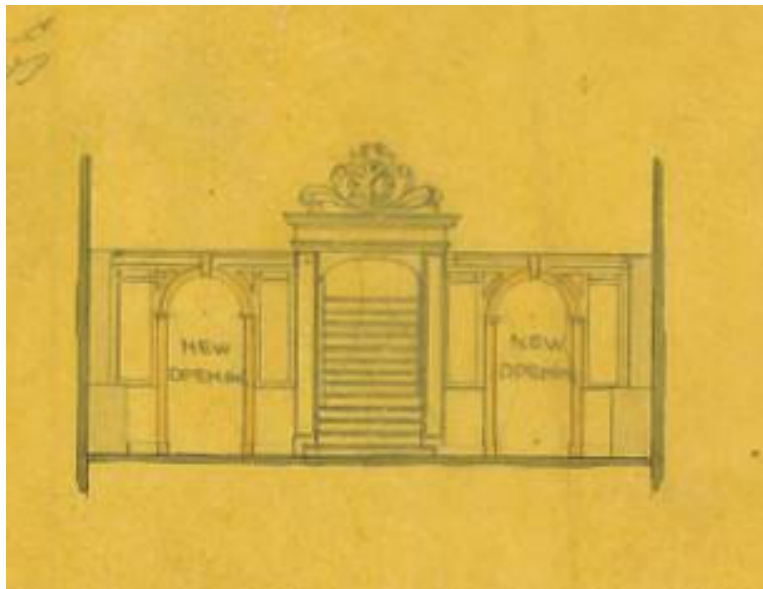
Detail of Thomas Sutton's elevation for the end wall of the Showroom. This shows the central stairs leading up into the first floor Showroom and the new stairs either side leading down into the 1881 lower showroom (source: Worcester Porcelain Museum).
